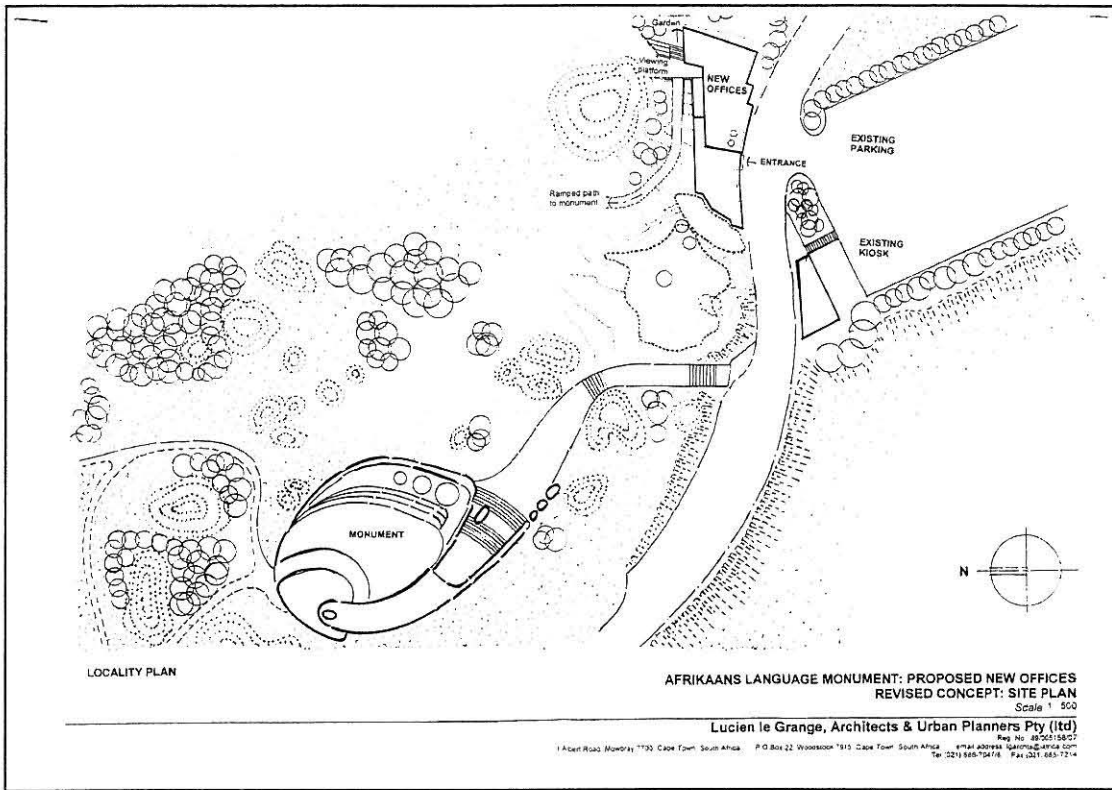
The architect plan indicating the location of the monument, the car park and the proposed new offices.
